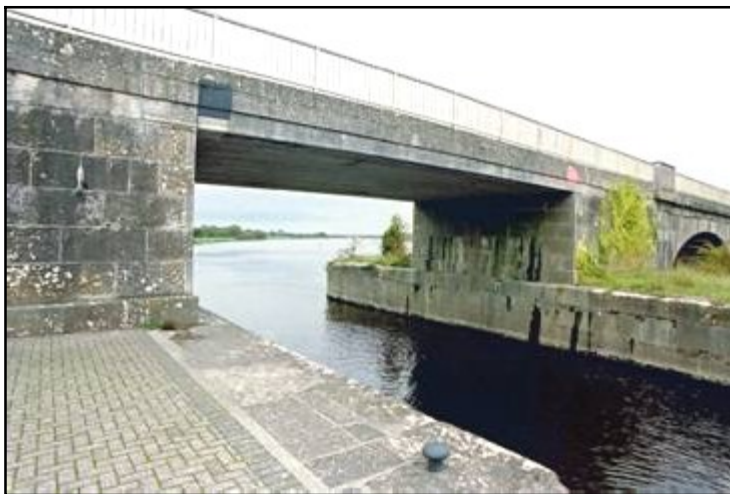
Beam bridges: reinforced-concrete span over Shannon Navigation at Banagher (021-006).
